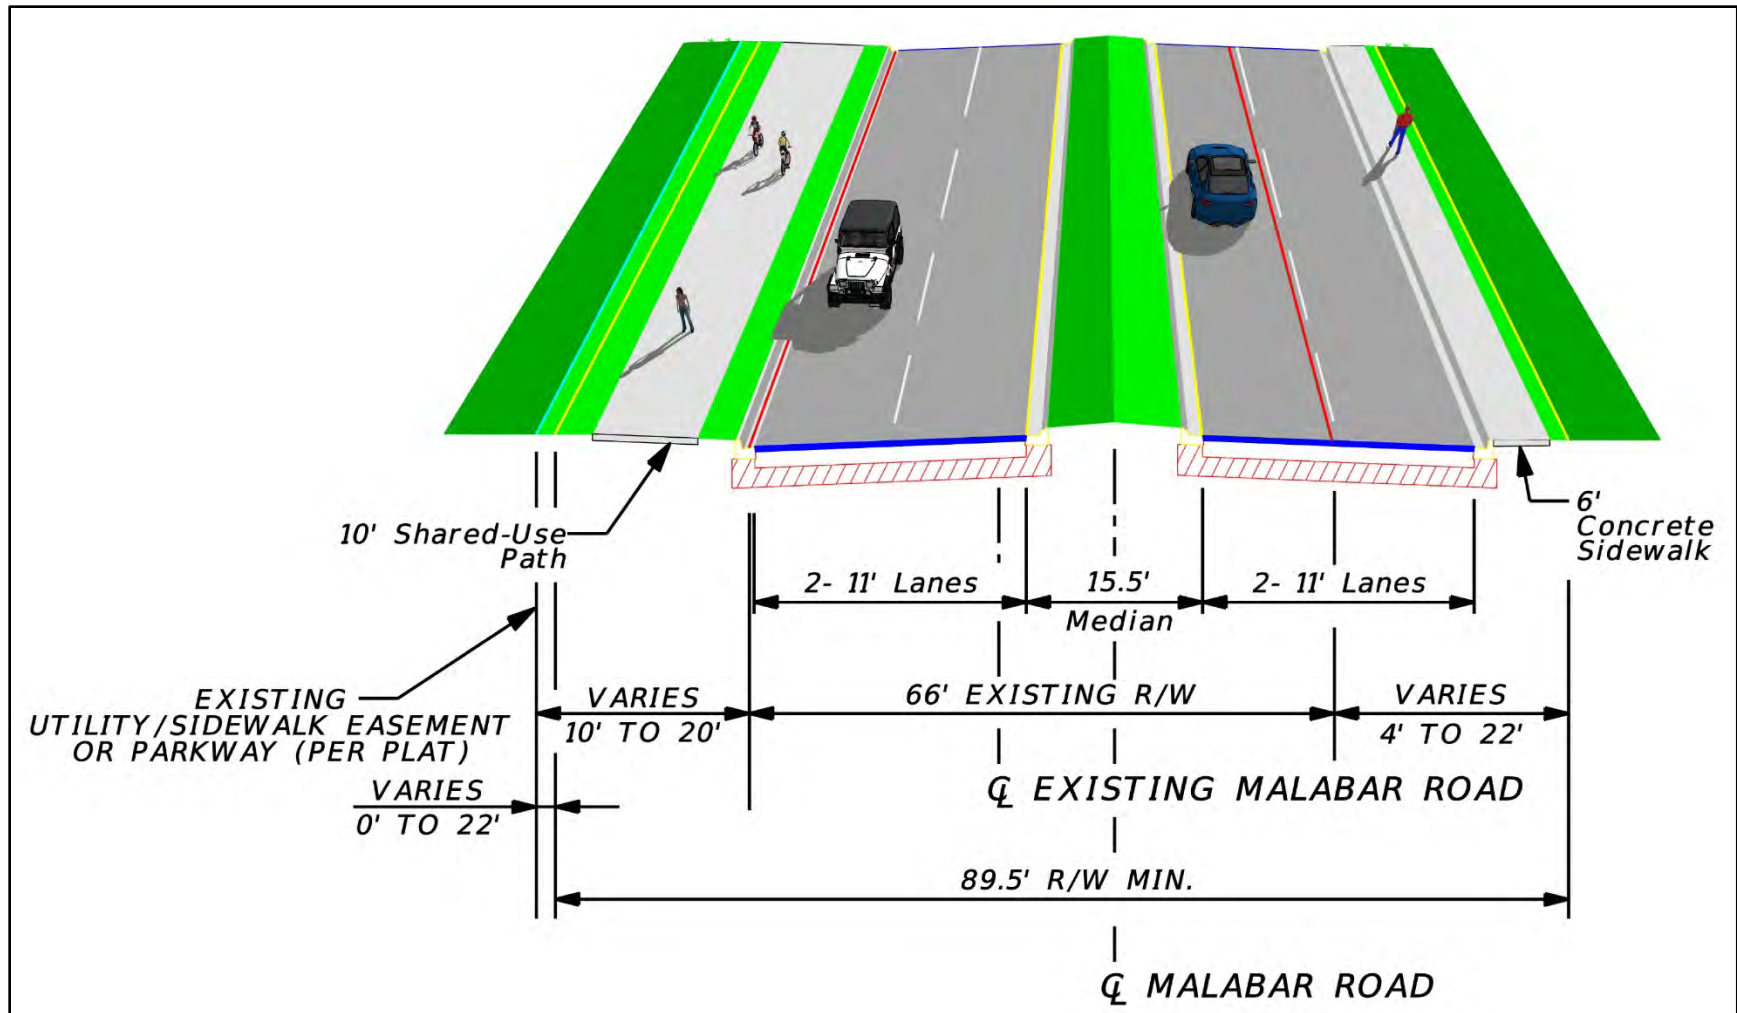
89.5' Alternative A – St. Johns Heritage Parkway to Canal C-10
